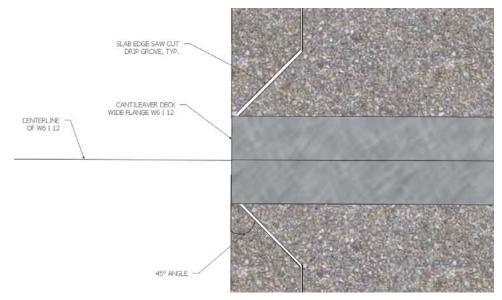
Drip Notch Edge Detail (Underside Plan View)
